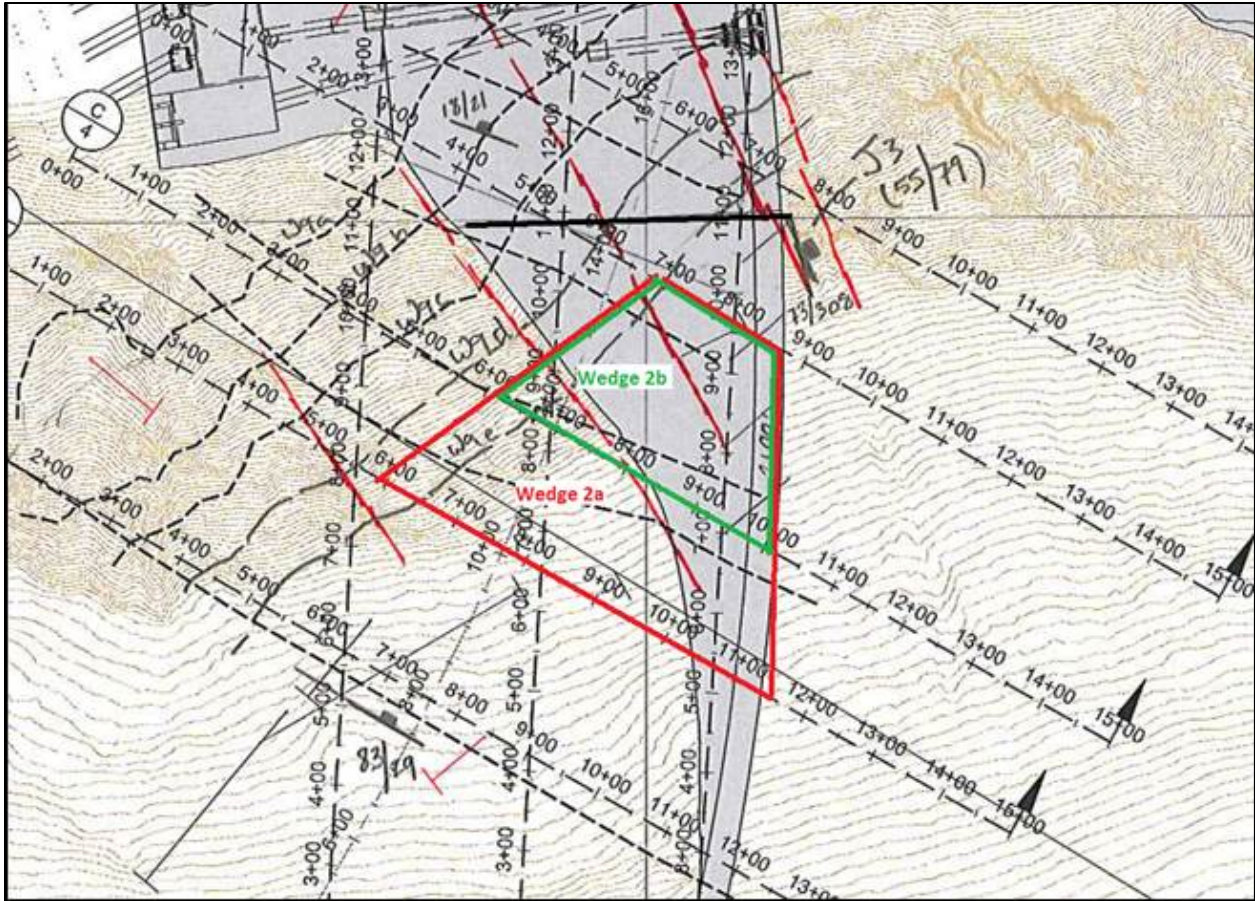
Plan, Left Abutment Wedges 2a and 2b
